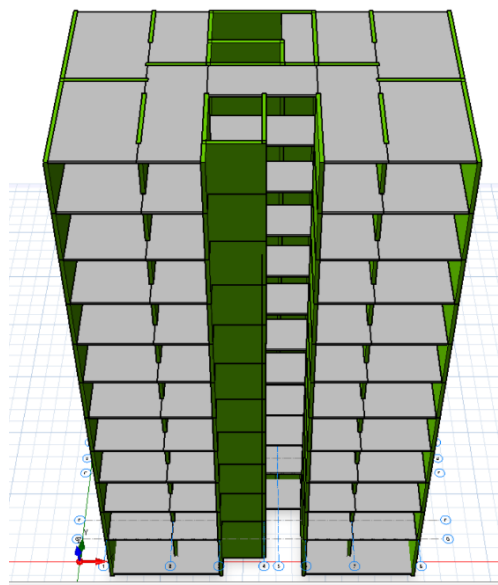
RC10 Model (Reinforced Concrete Model - 10 Floors with 1 Basement)
